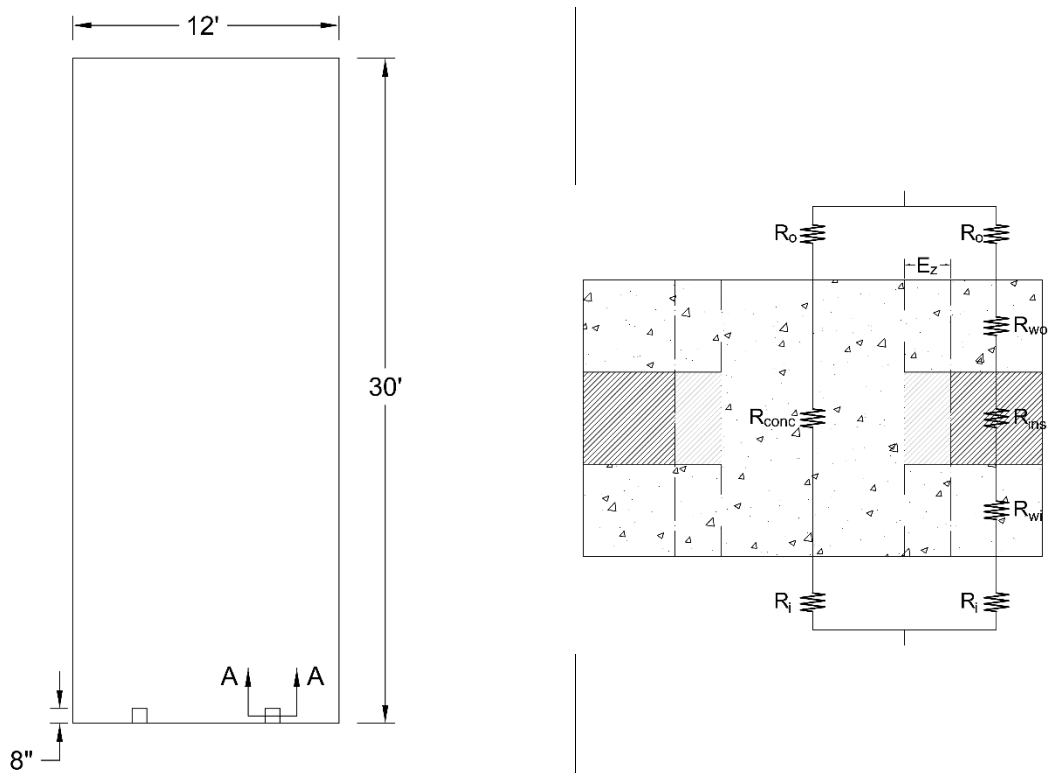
Foundation example panel layout and cross-section with electrical circuit analogy
